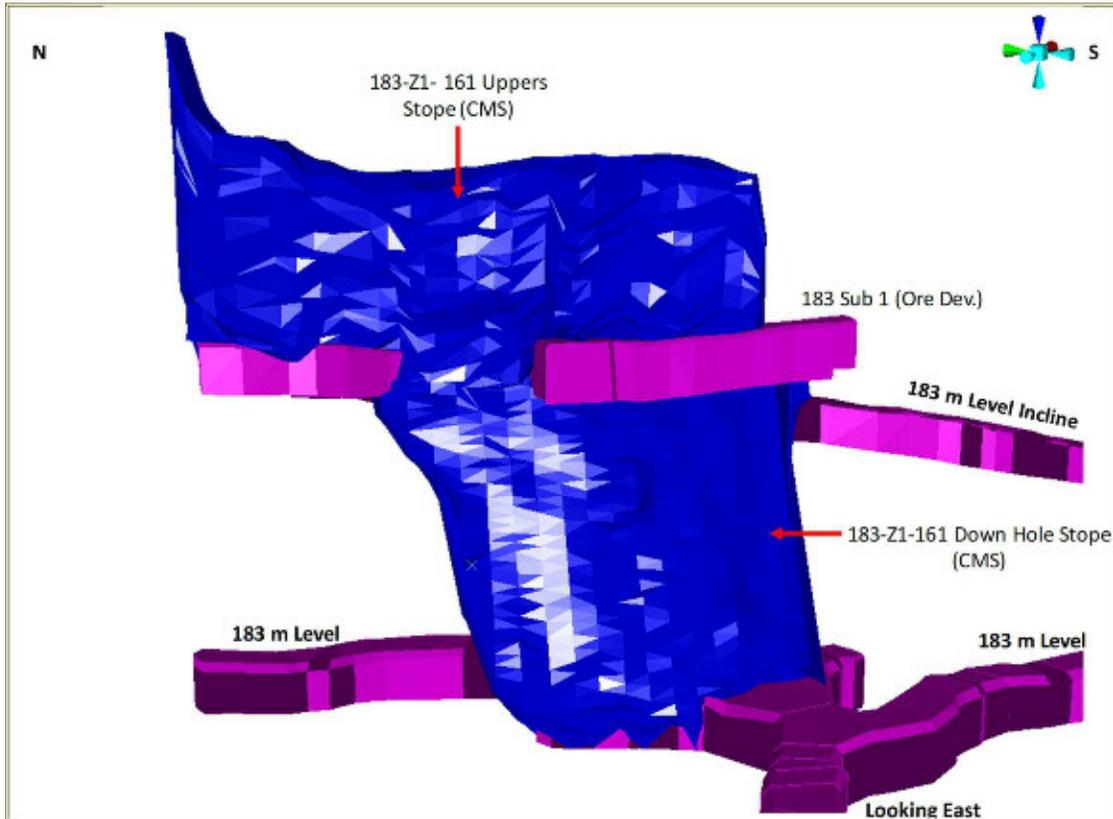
183-Z1-161 Test Stope – Looking East (Source: Rubicon, 2019)
